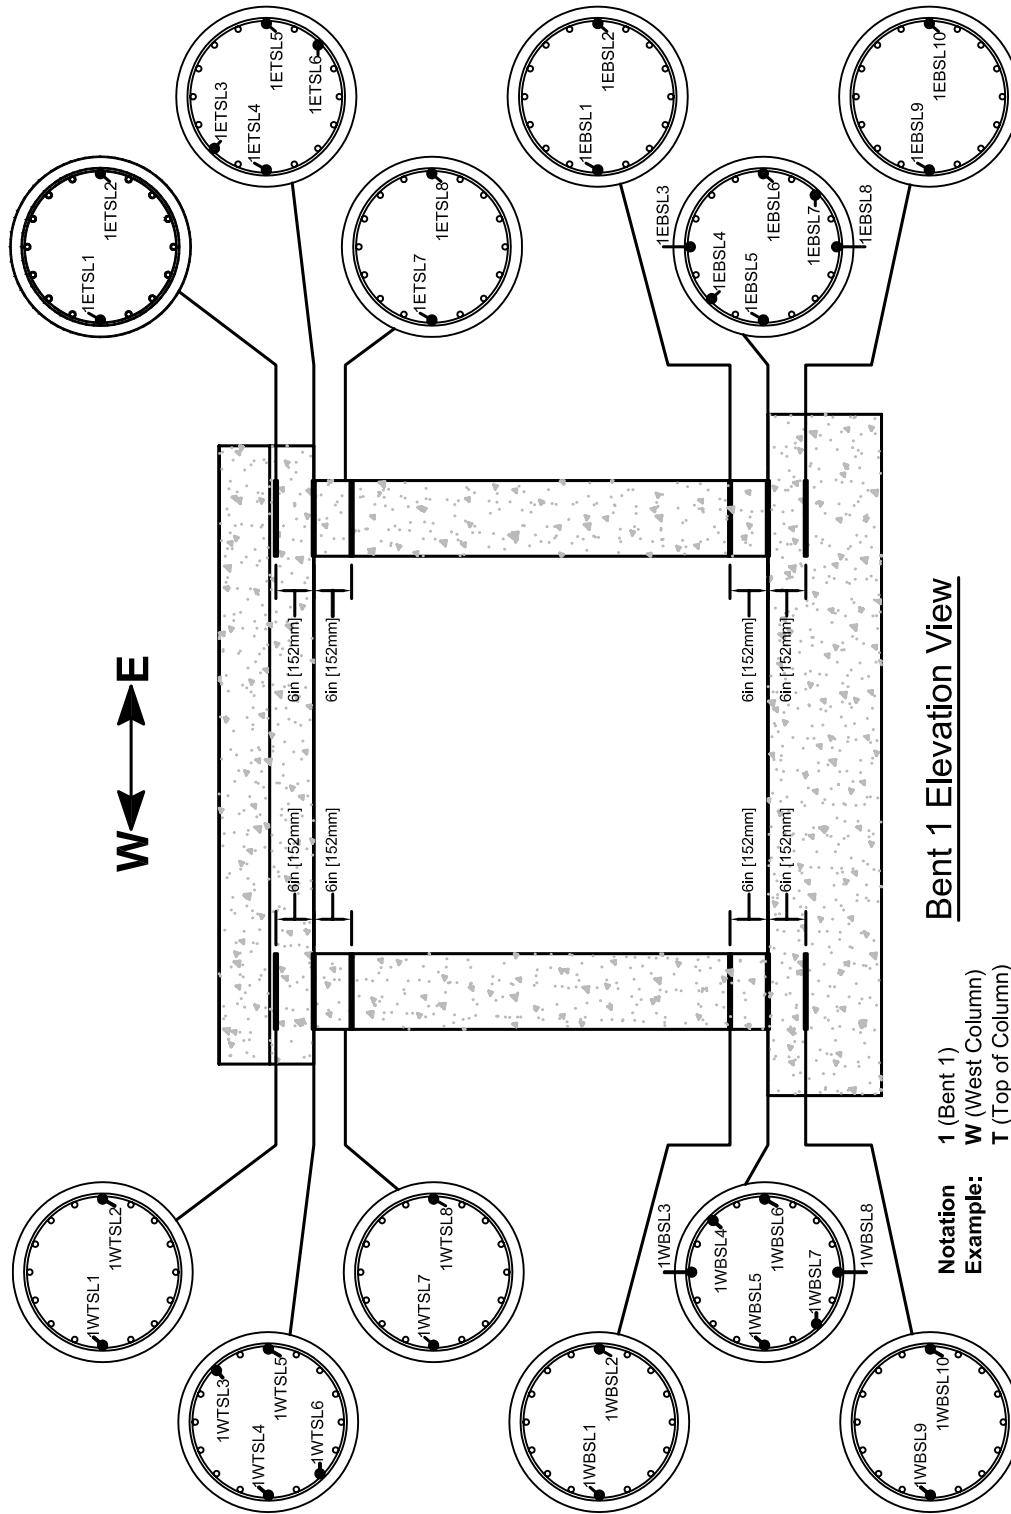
Instrumentation plans sheet 1 of 8; Column curvature gauges.
